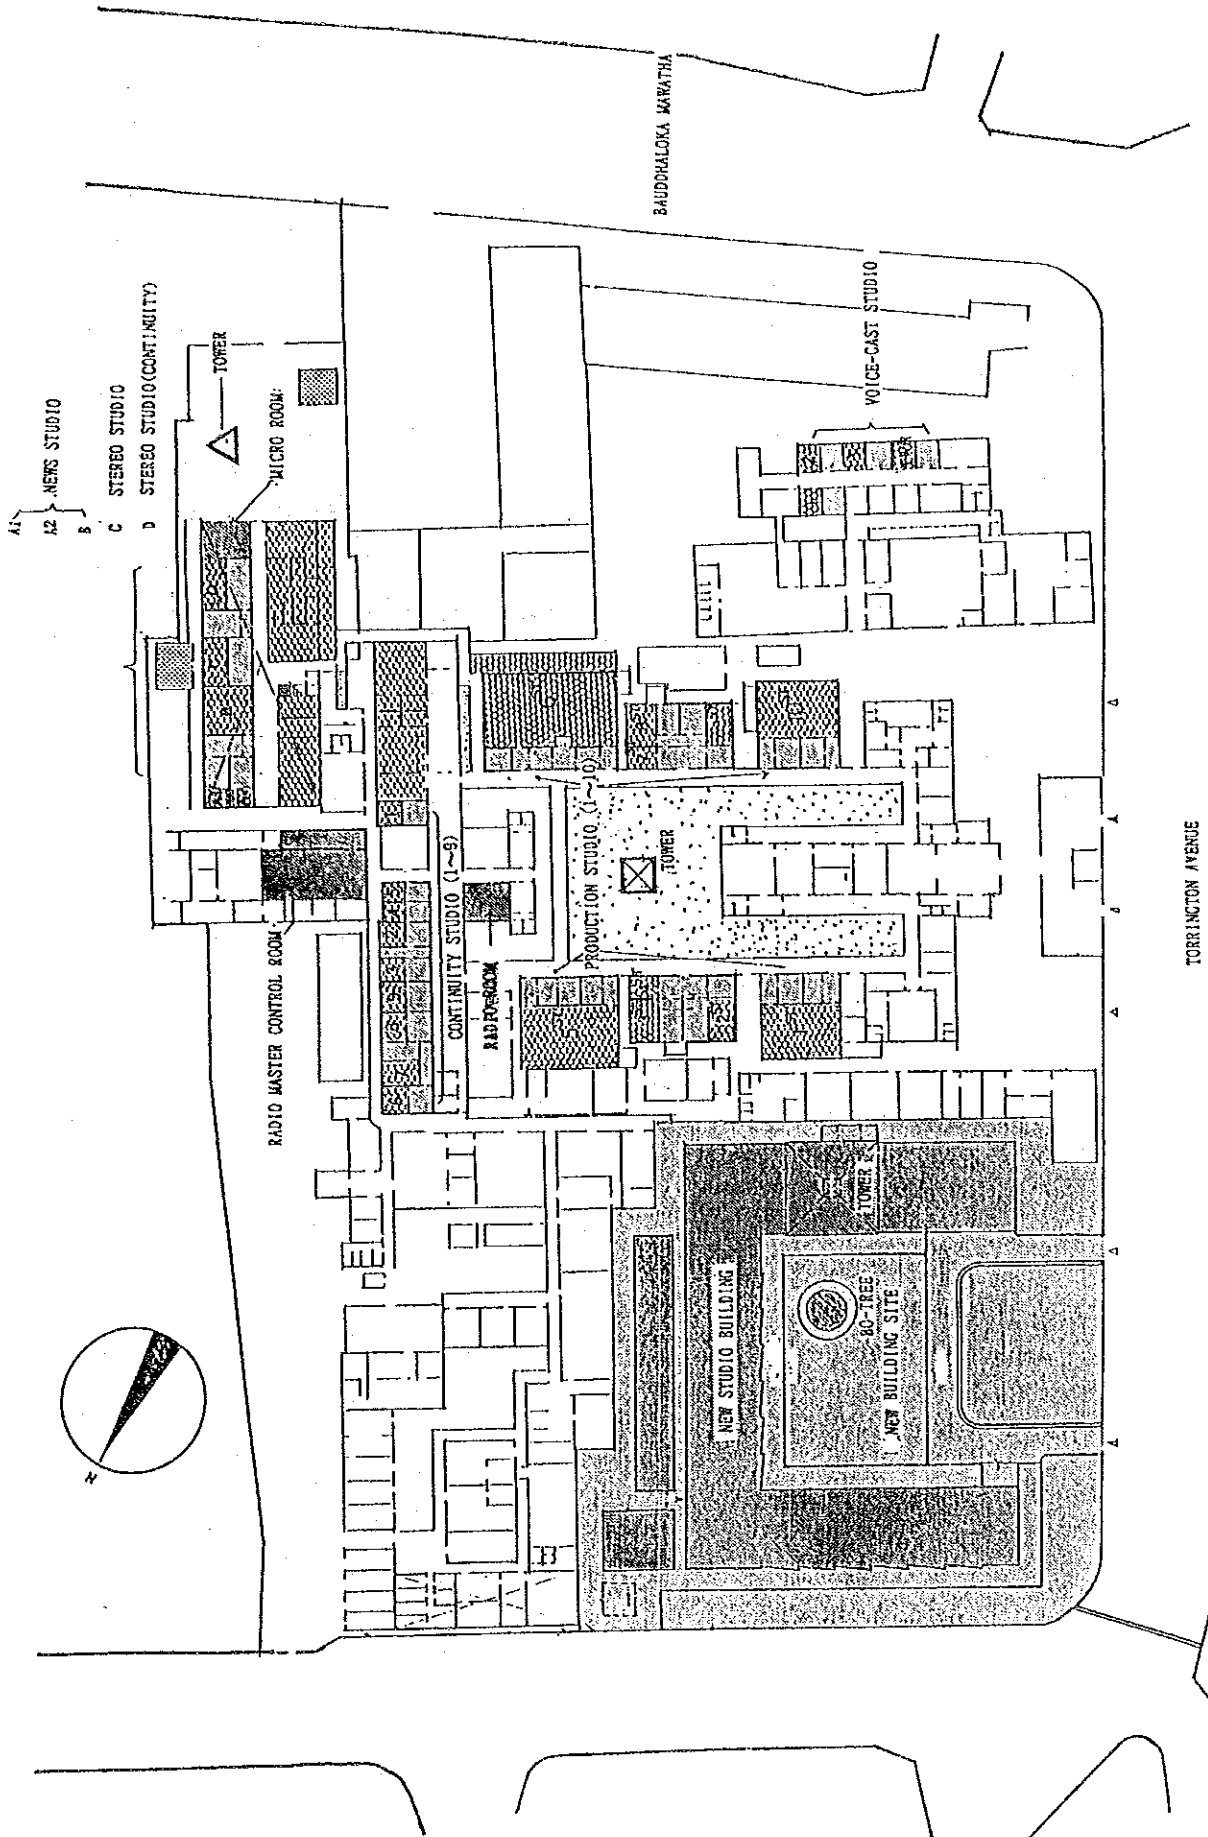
LAYOUT OF EXISTING SLBC STUDIOS AND MASTER CONTROL ROOM SCALE 1:1000
